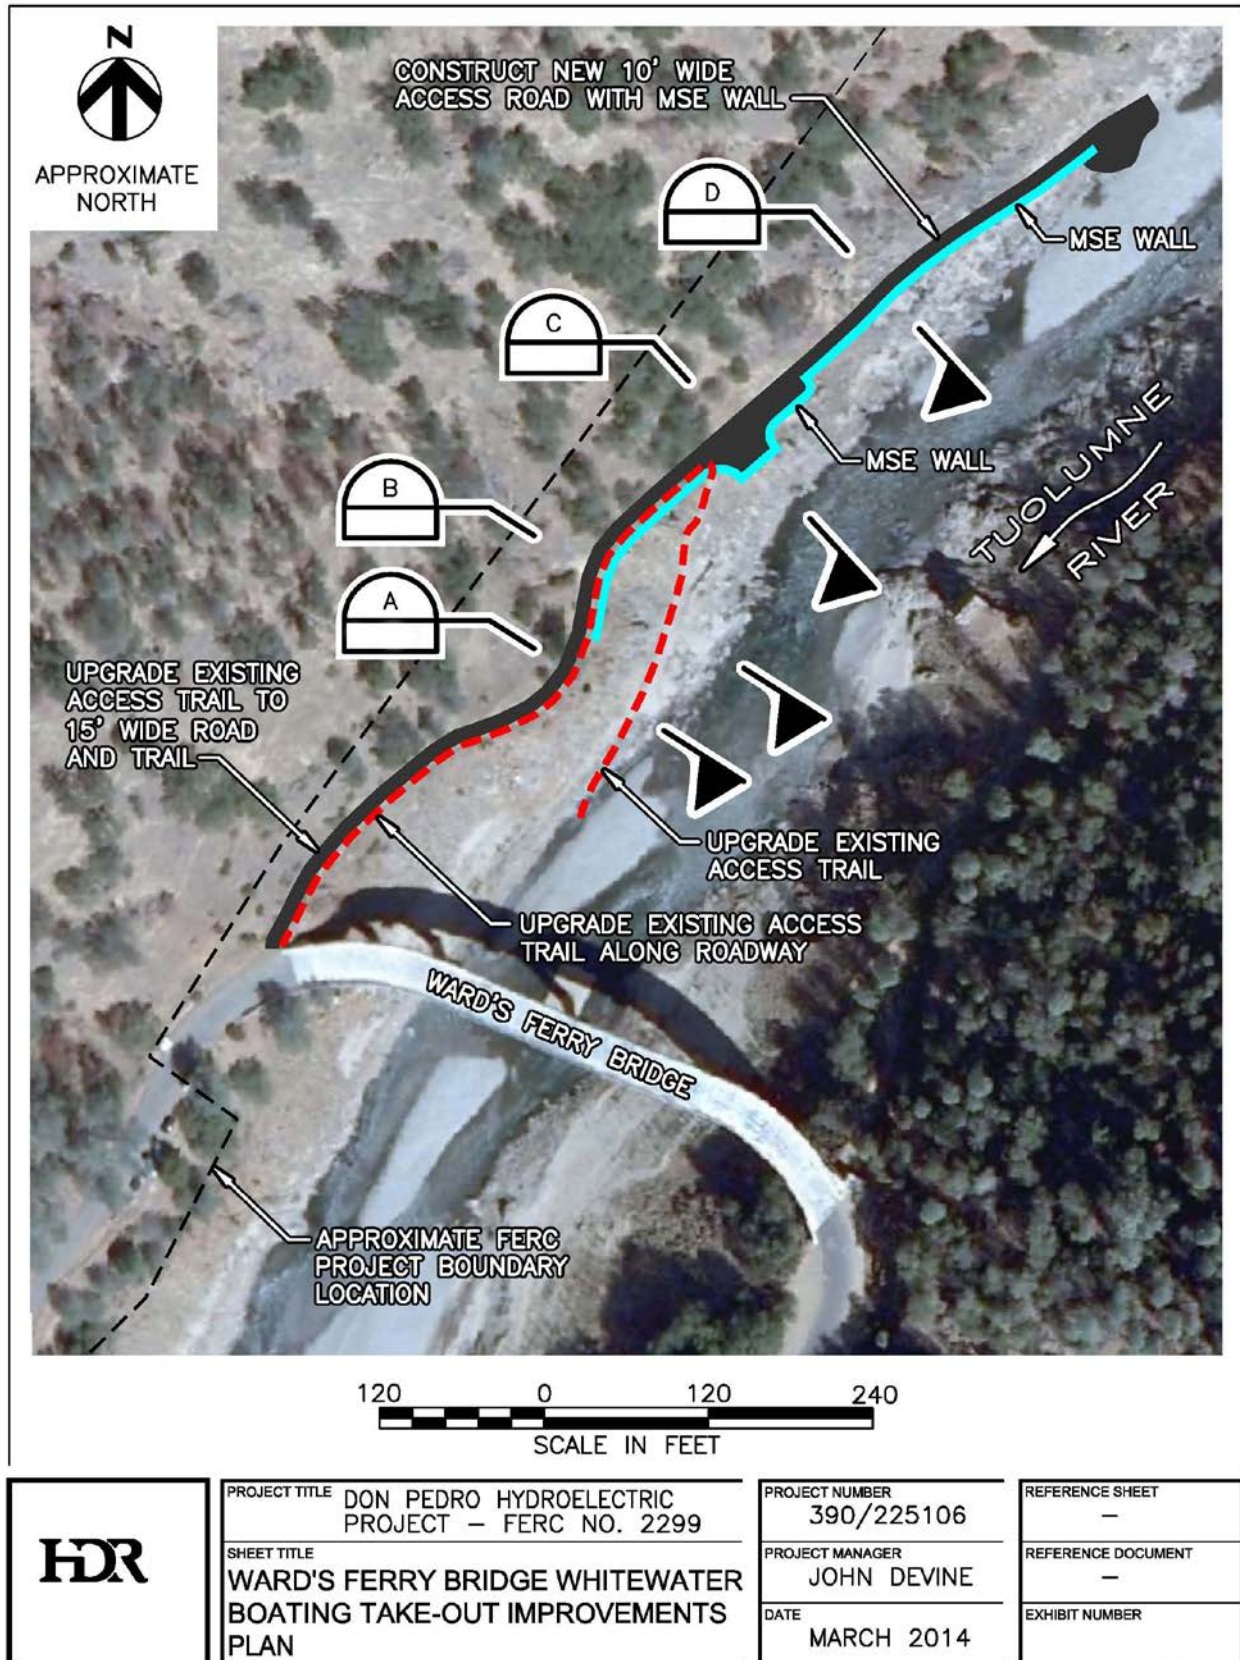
Ward's Ferry bridge whitewater boating take-out improvements – plan view.
